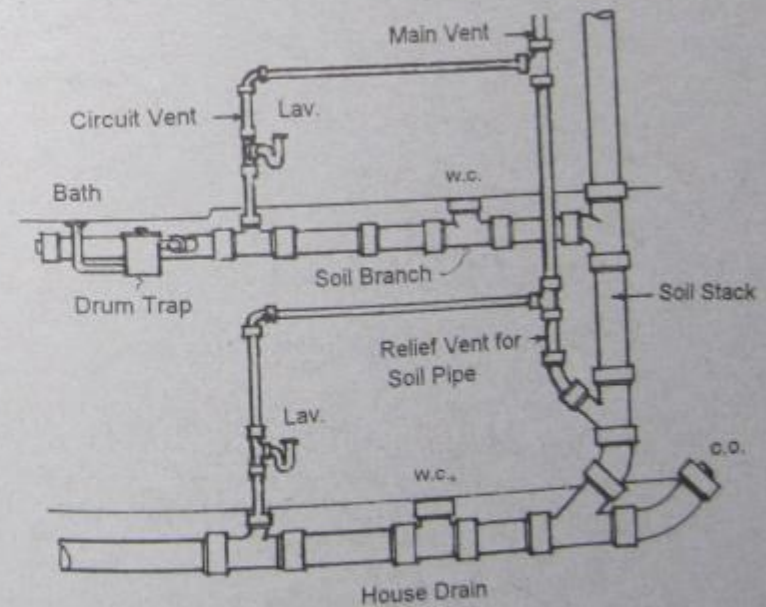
RELIEF VENT FOR TALL BUILDING
